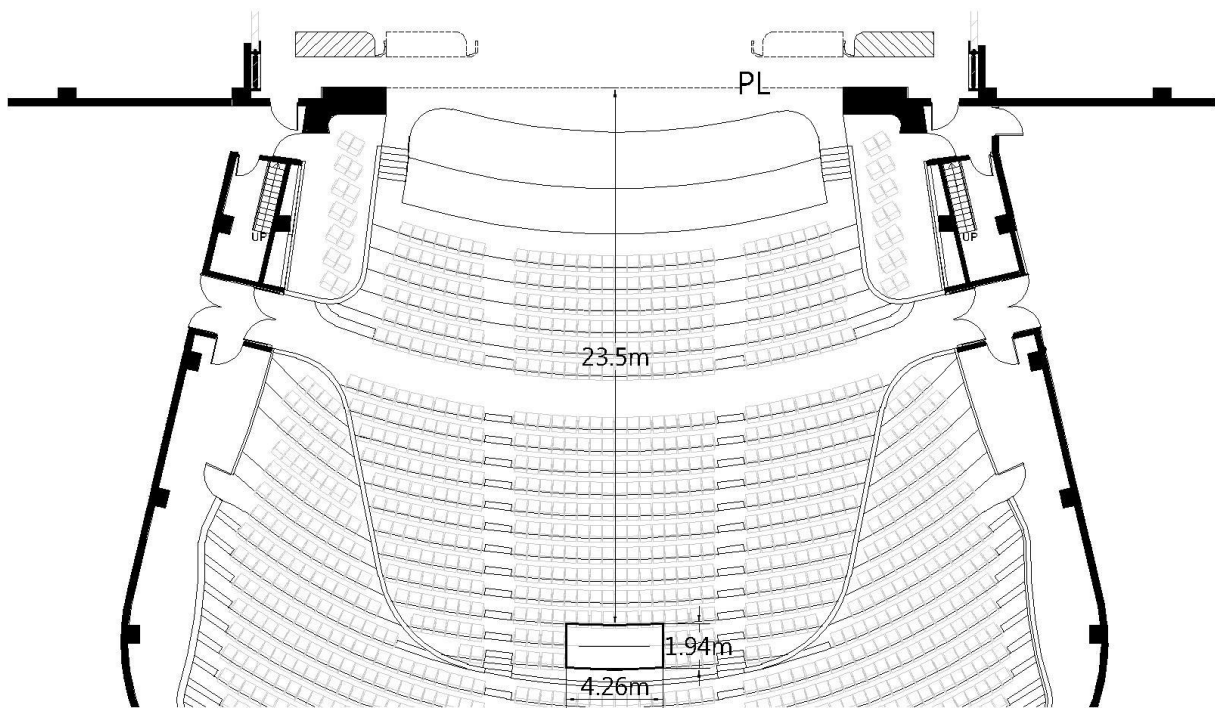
Auditorium Control Area Elevation Platform location plan
